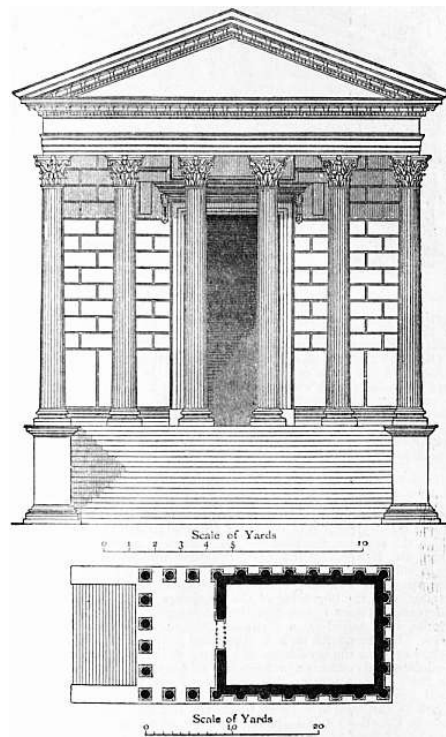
Elevation and plan of the Maison Carrée, Nîmes.
